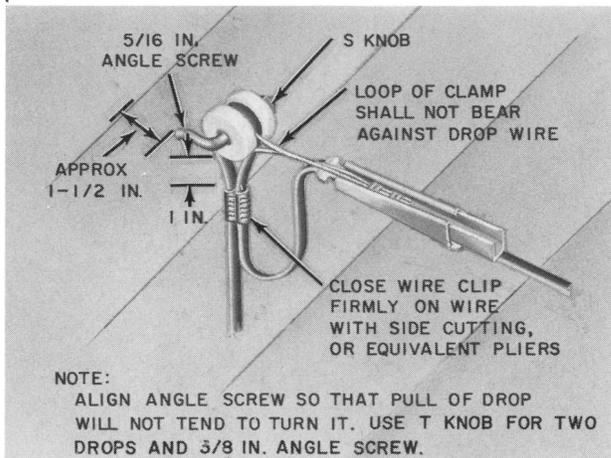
First Attachment—Angle Screw Drop Wire Run in Vertical Direction on Building (Single)
